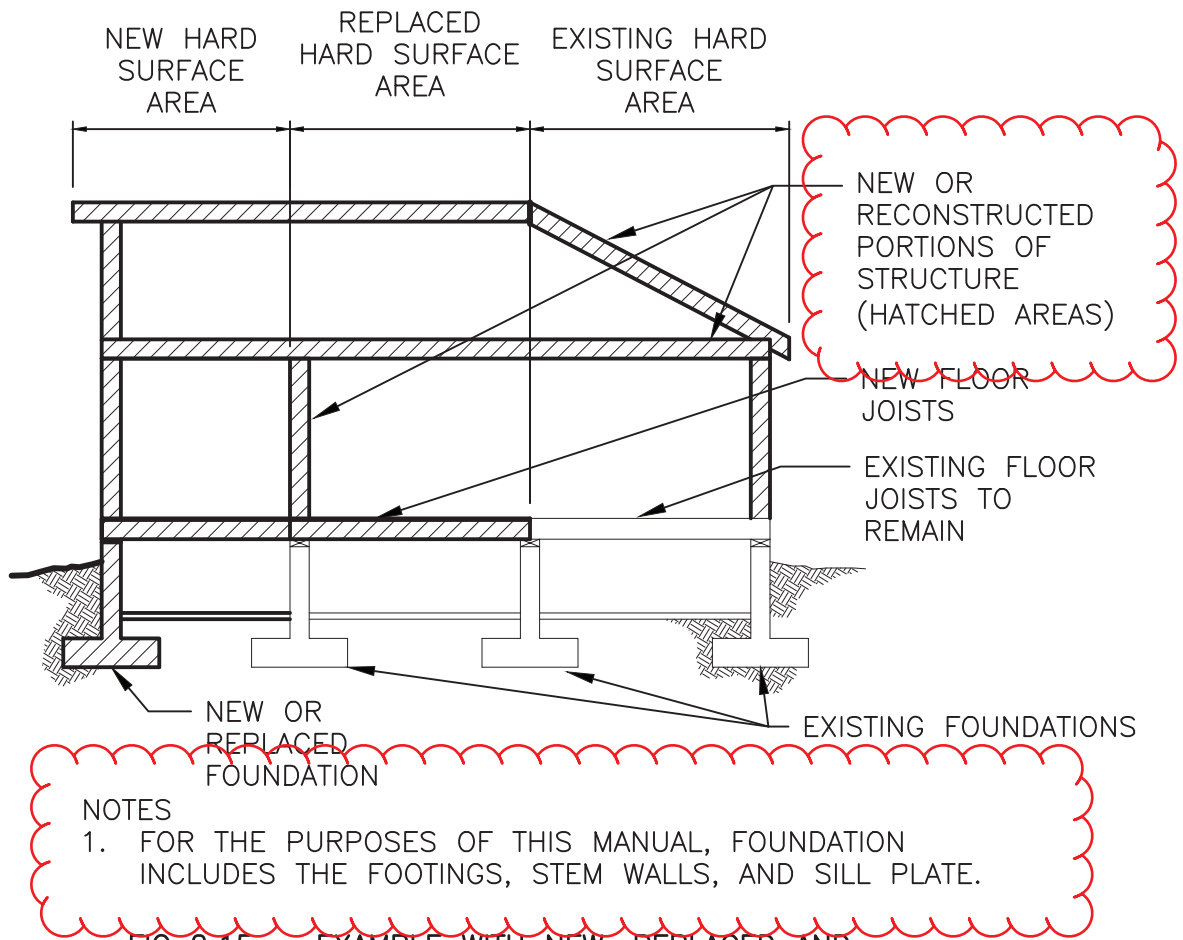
EXAMPLE WITH NEW, REPLACED AND EXISTING HARD SURFACES
